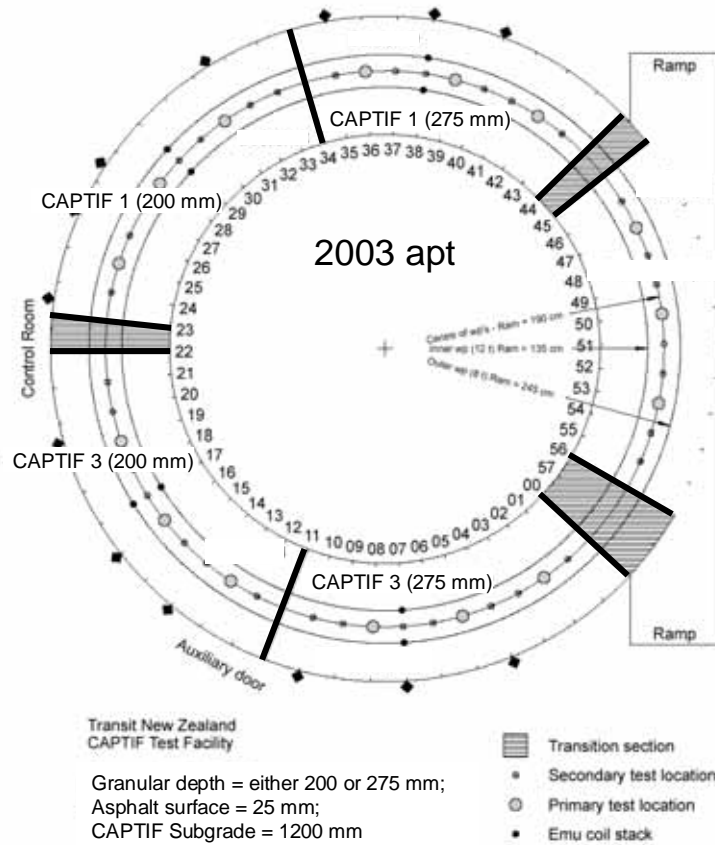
Layout of CAPTIF pavement test sections for the 2003 test.
